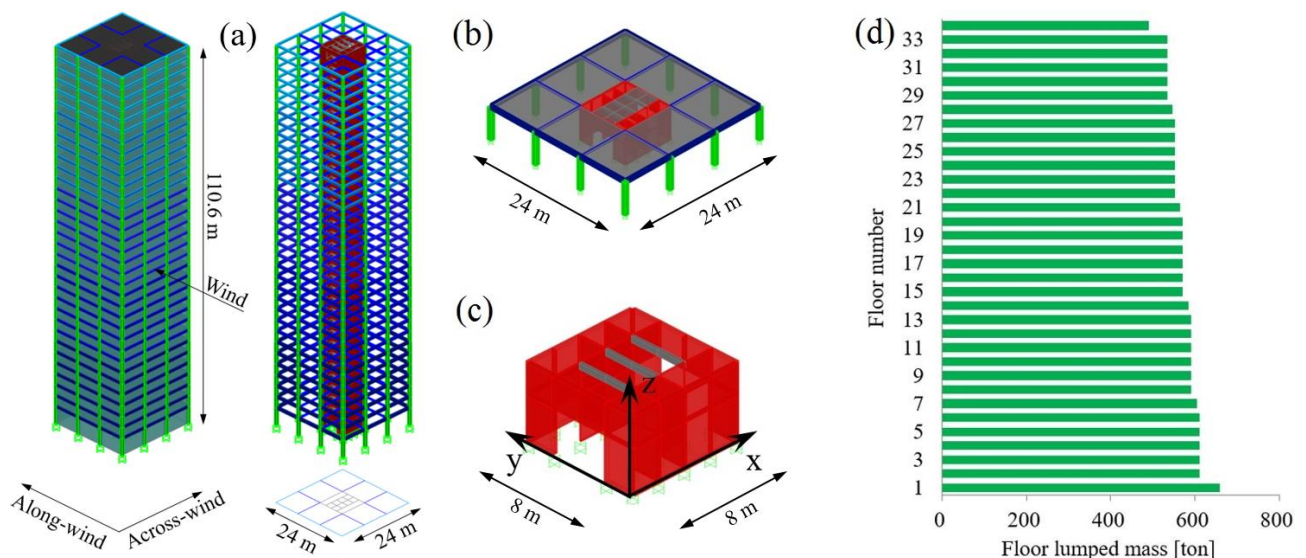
(a) Case-study 34-storey building; (b) typical floor and core-frame lateral load-resisting system; (c) geometry of r/c core; (d) floor mass distribution.
